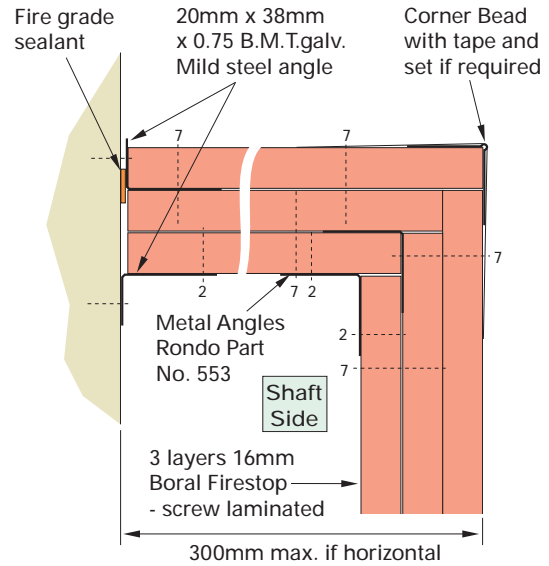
A. Typical Corner & End Detail FRL 90/90/90
